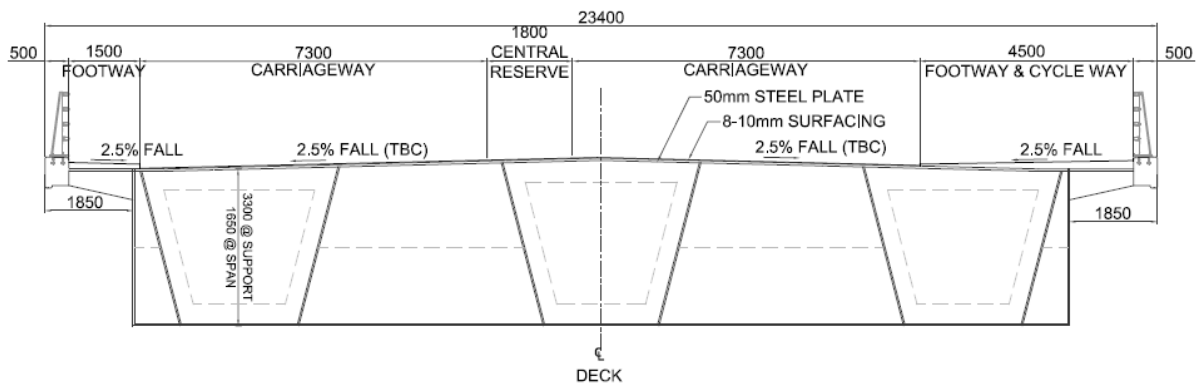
Trapezoidal box girder arrangement deck (adapted Mouchel/WSP report)
